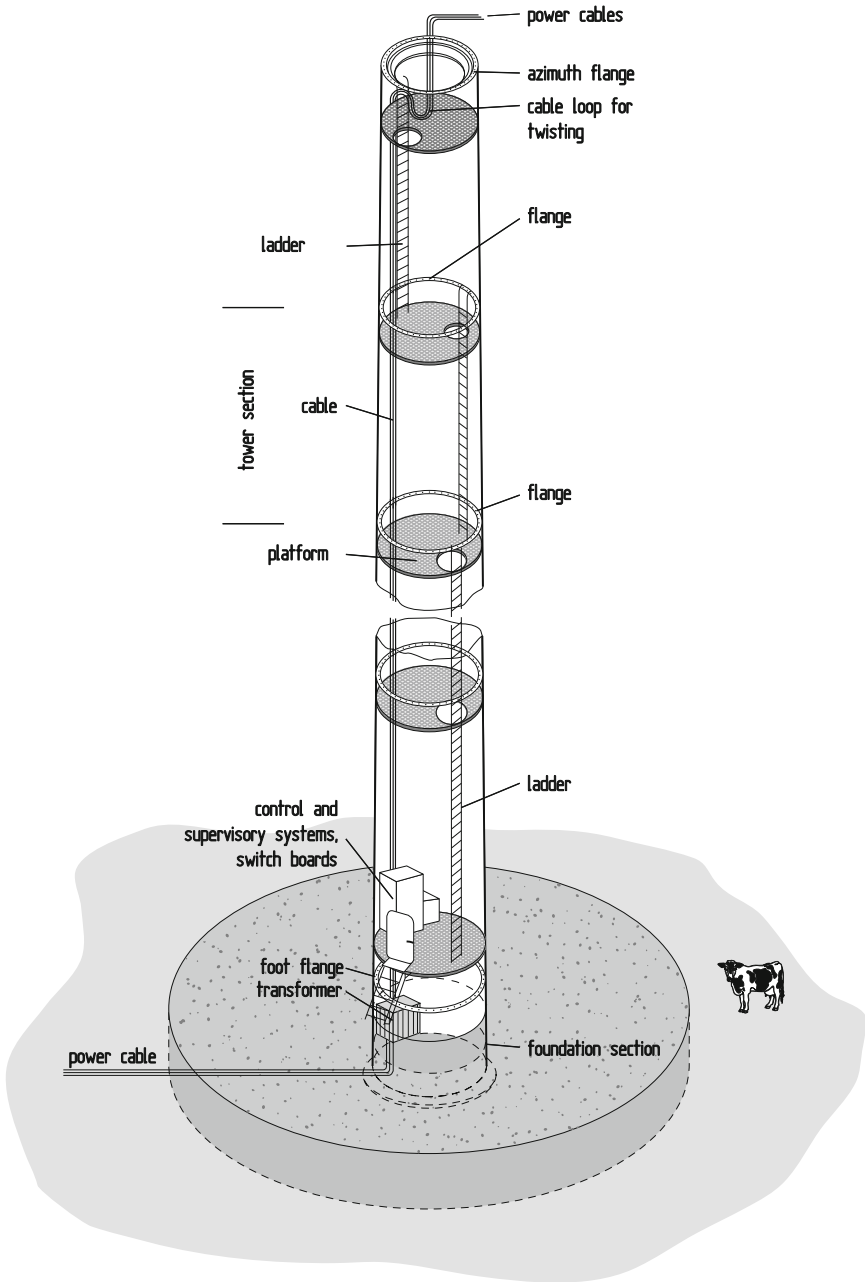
Tubular-steel tower with installations of a large wind turbine
